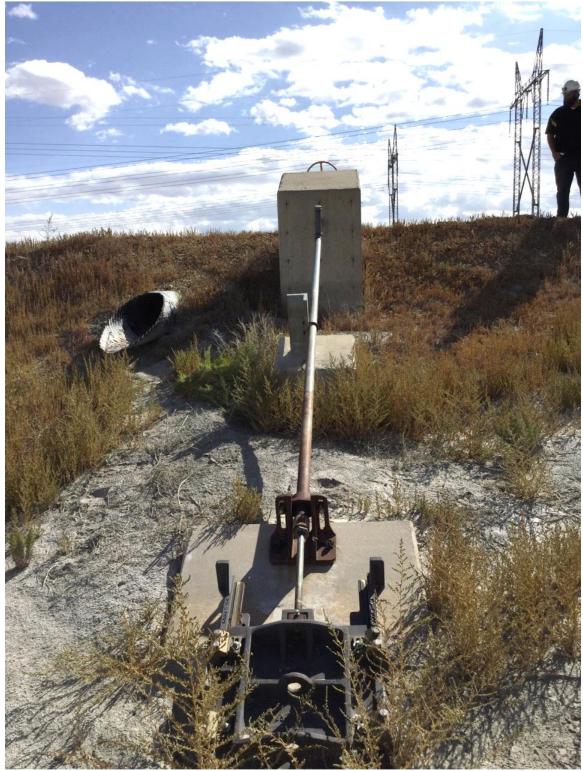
View of retention pond inlet culvert (downstream end), looking east.
